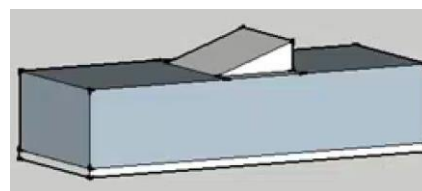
Sloped roof cathedral ceiling with step wall, typical with flat roofs.
